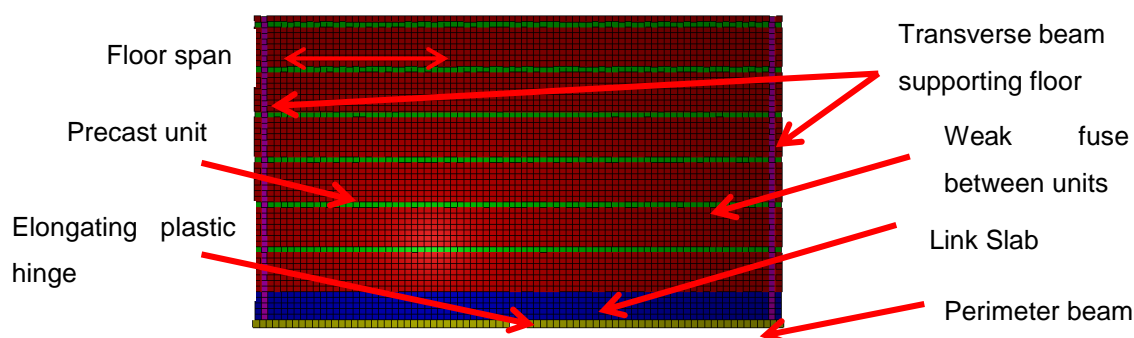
Base model layout – Arrangement 3 (Precast floor spanning parallel to elongation – spanning past hinge)
